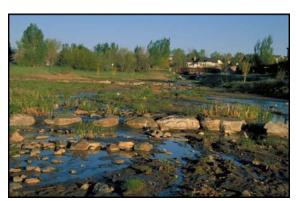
Upstream View toward Holly Street with Lower Drop No.1 in Foreground
